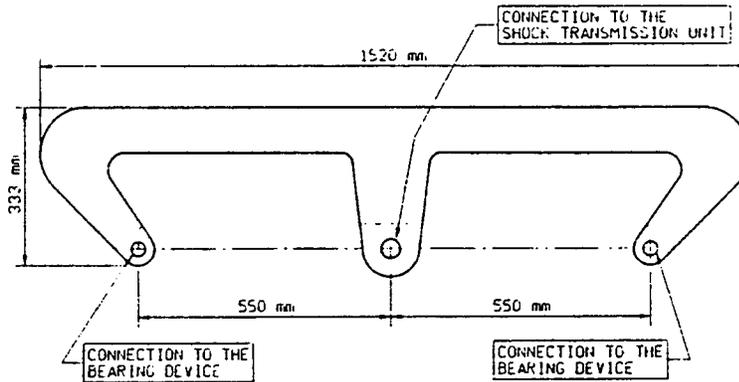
Yielding Steel Devices; (c) Multi-directional crescent moon-shaped steel damper (Courtesy of ALGA) (Priestley, 1996)
